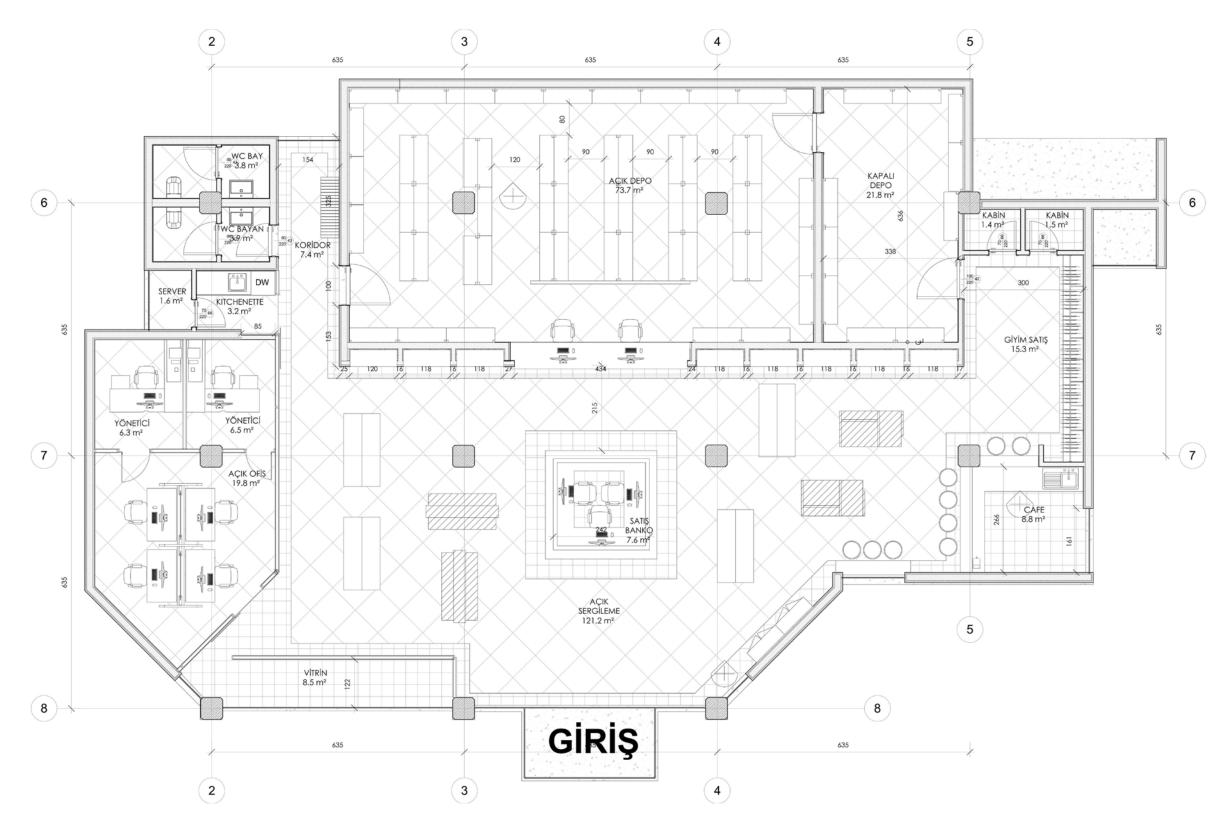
Renovation Project Prepared by the Effort of METU Development Foundation (*ODTÜ Geliştirme Vakfi*), 2017 Source: METU Development Foundation
